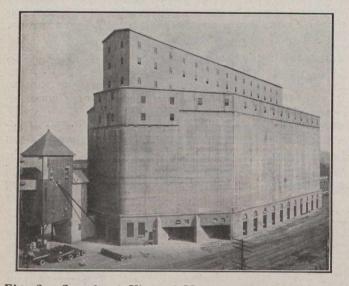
Completed View of Montreal Harbor Commissioners' Elevator No. 1.
